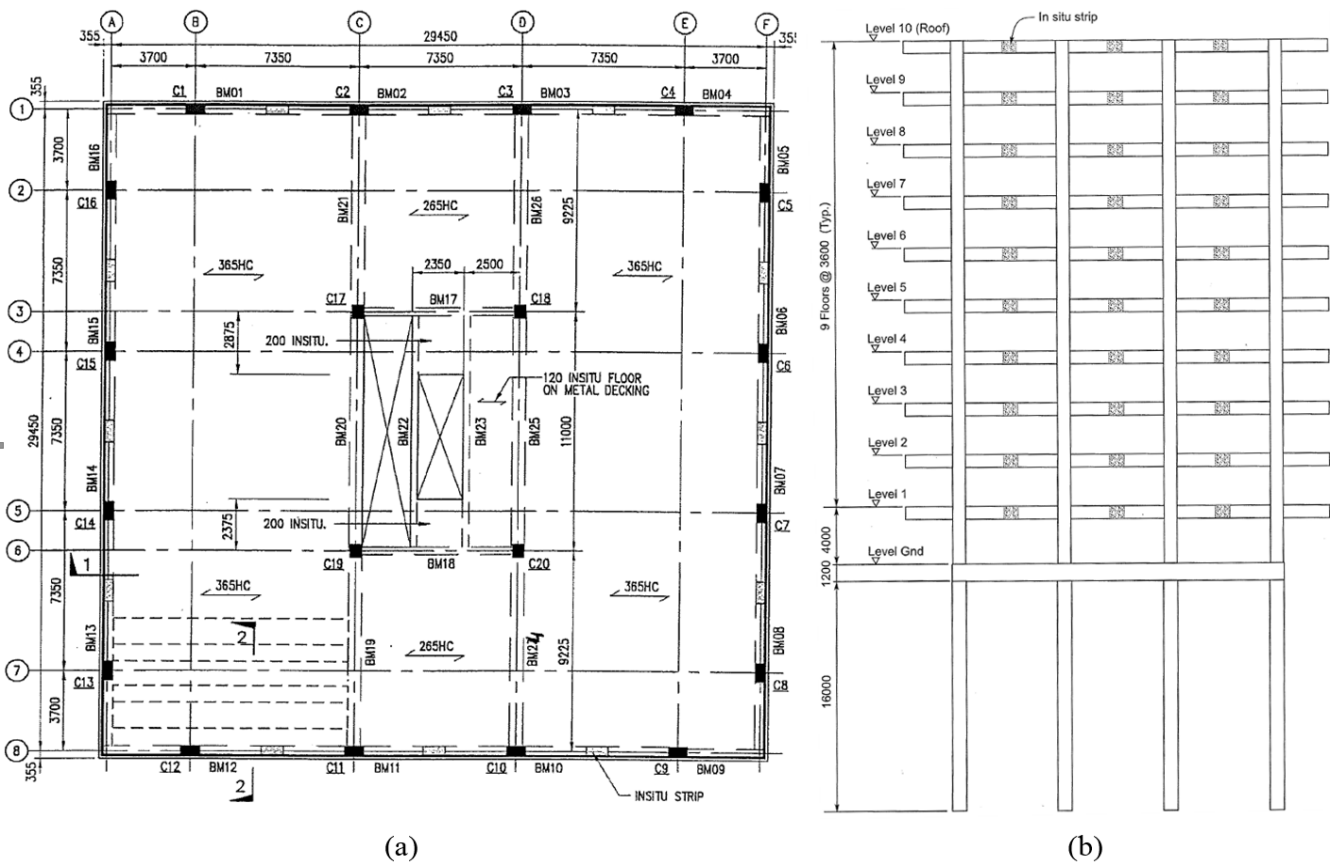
(a) Plan and (b) elevation of the Red Book building [18]
